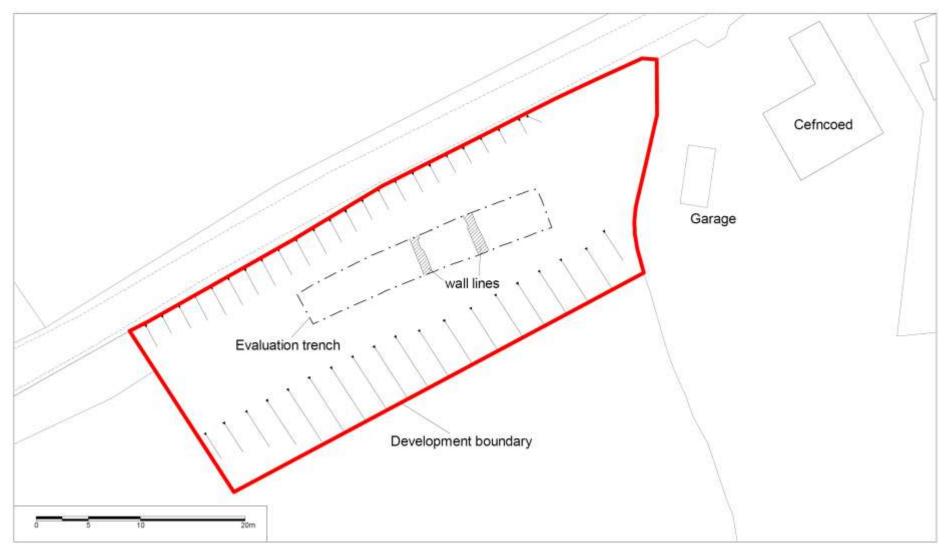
Detailed trench location plan, showing Cefncoed, Trench, development boundary and wall lines identified during the evaluation
